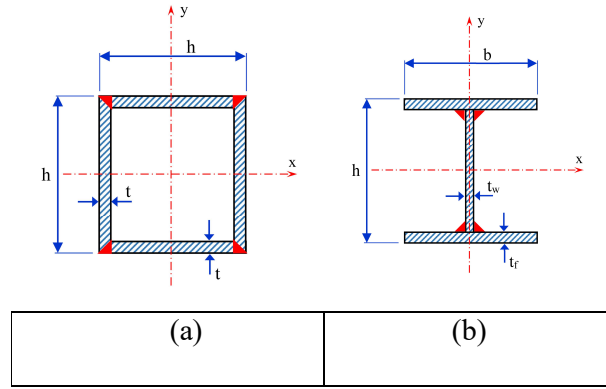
Cross-sections of Structural Components for, (a) Column, Zipper, and Braces, (b) Beams
